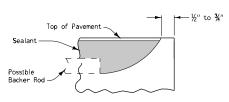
DETAIL "A" (Sawcut formed by conventional concrete sawing equipment)
